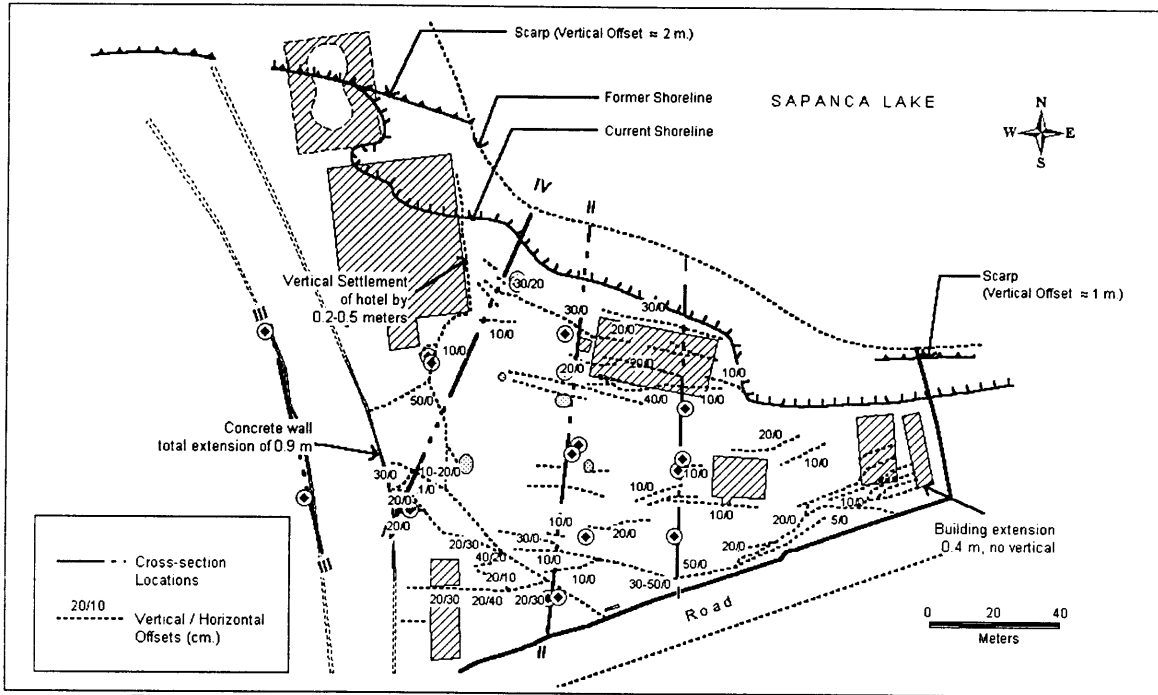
Measurements of cracks and fissures on the Sapanca Hotel Site
